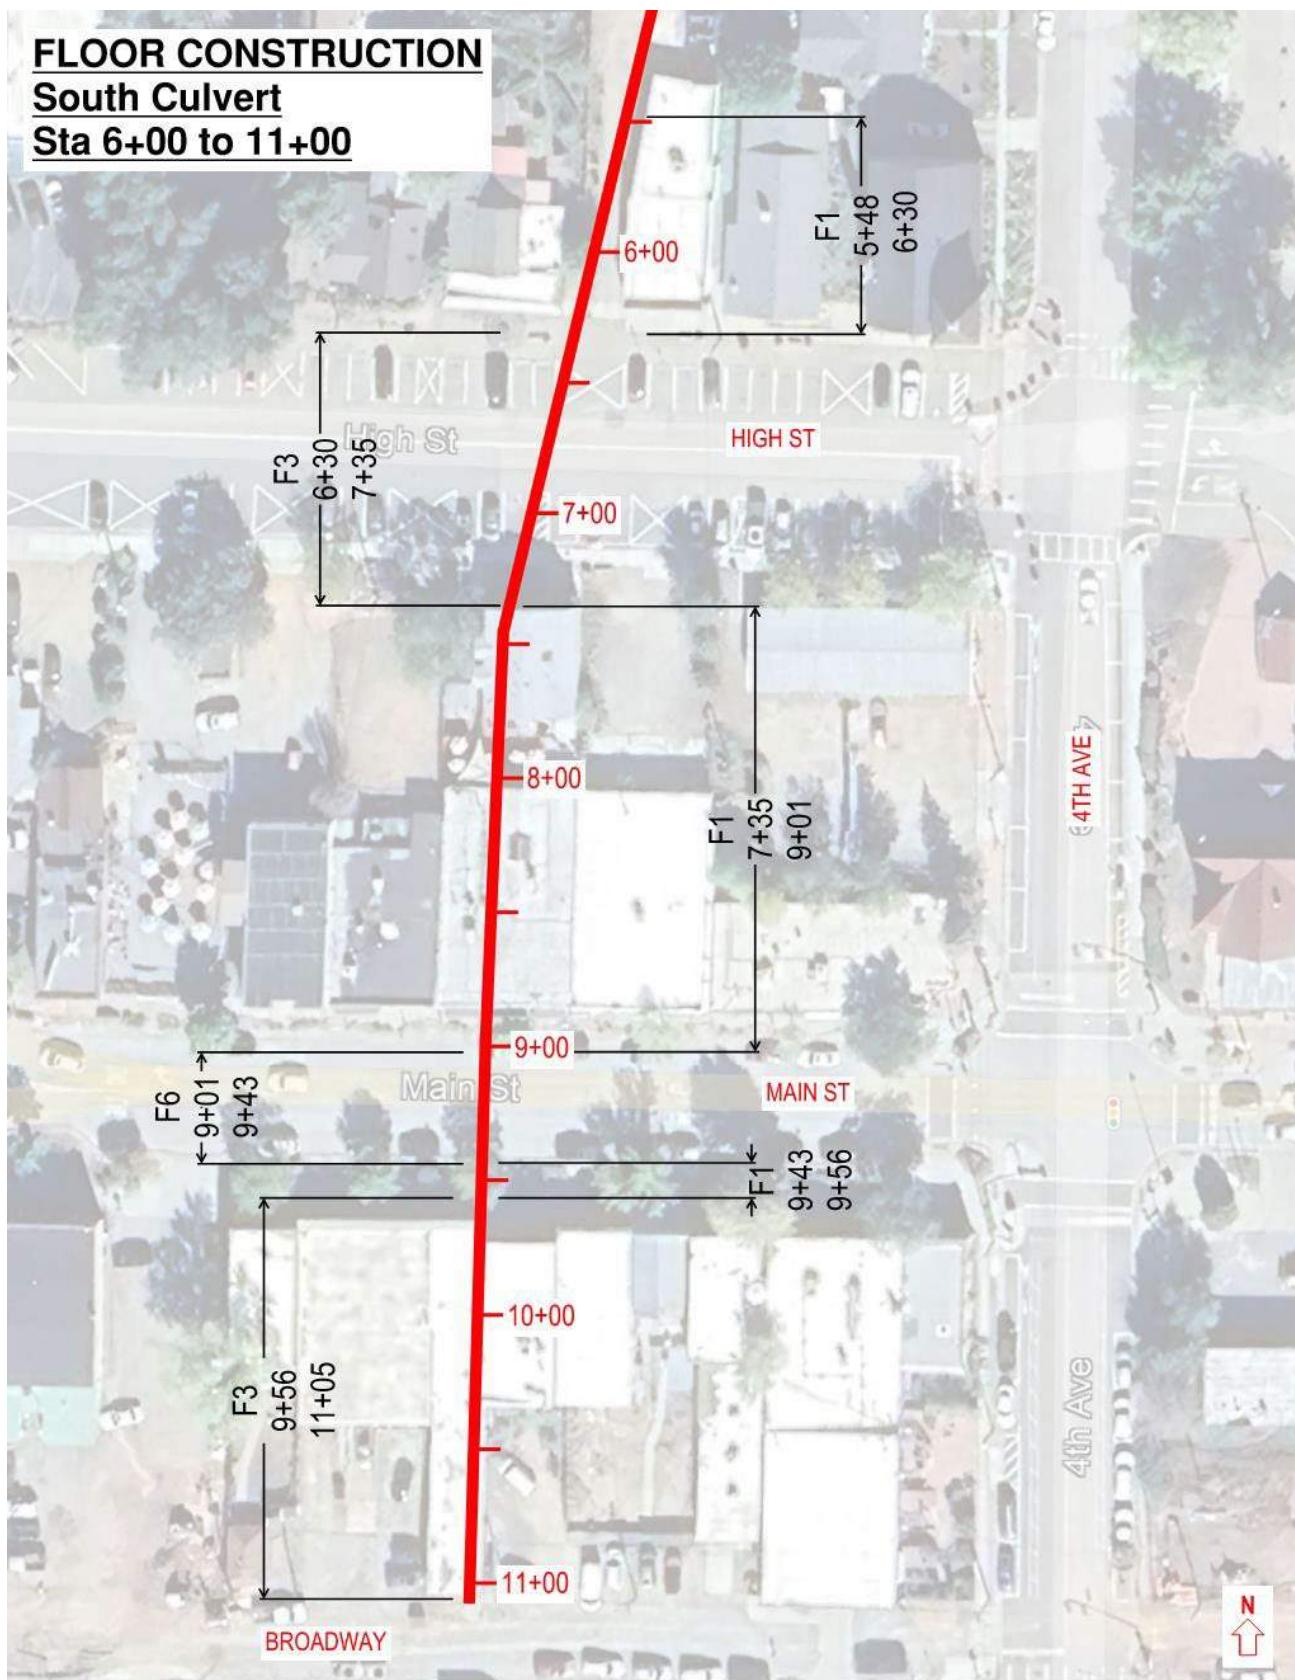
South Culvert Floor Construction Stations (S)6+00 to (S)11+00
